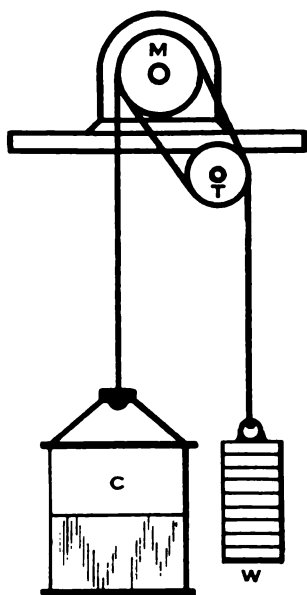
Simple arrangement of rope gearing for traction elevator.
